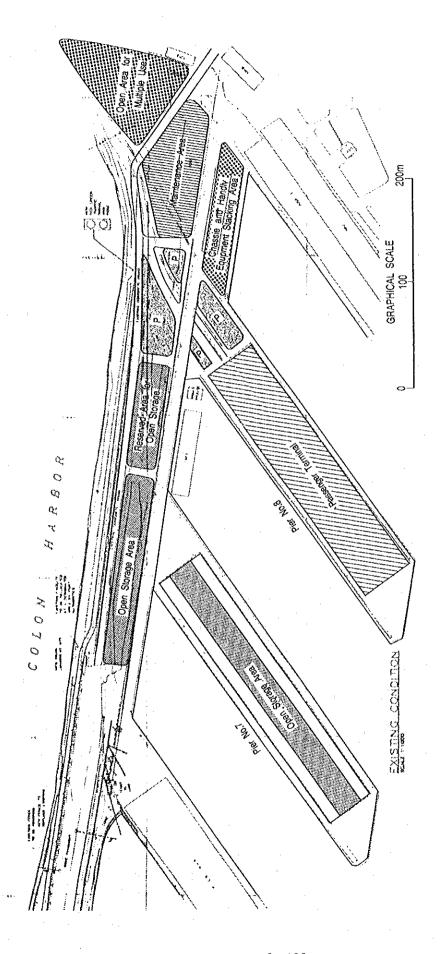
Land Use of Mole Area (Master Plan)
